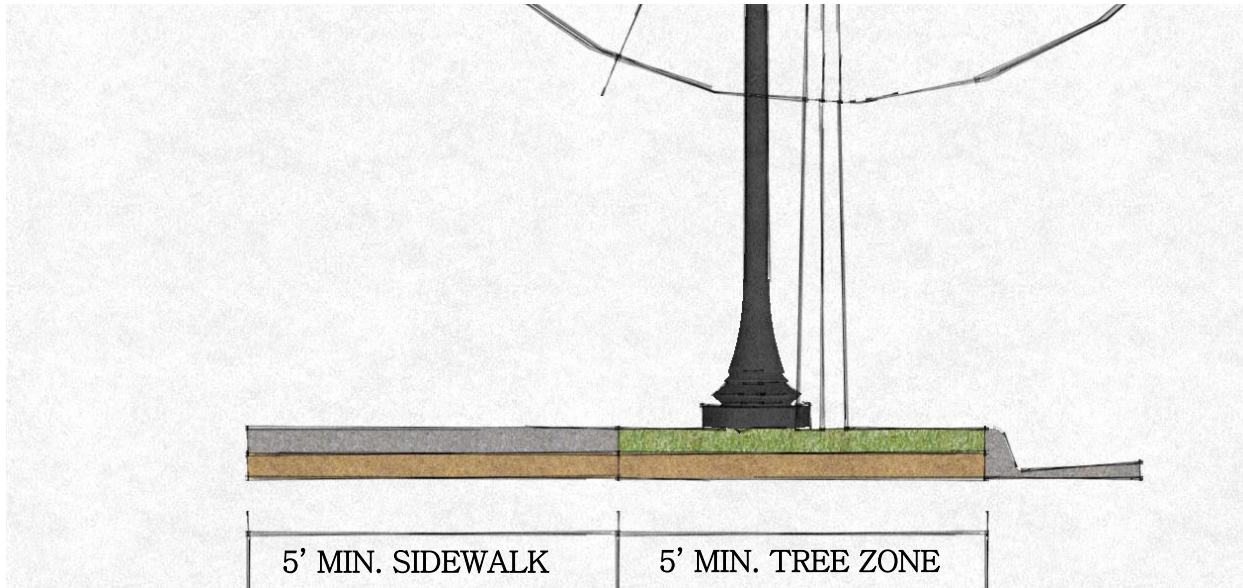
Transitional Downtown Streetscape Plan – Continuous Grass Verge Design
